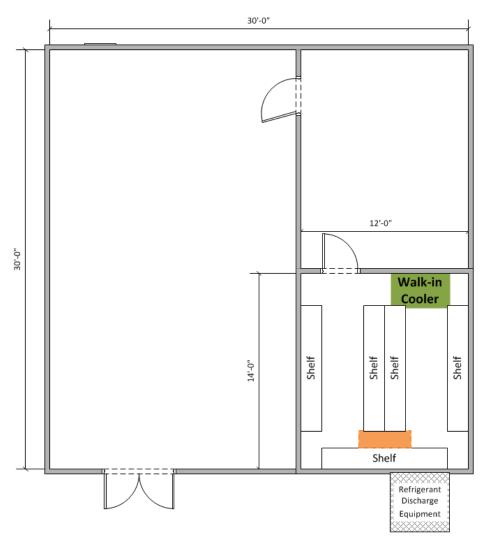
Walk-in cooler Layout within the 30'x30' test room
